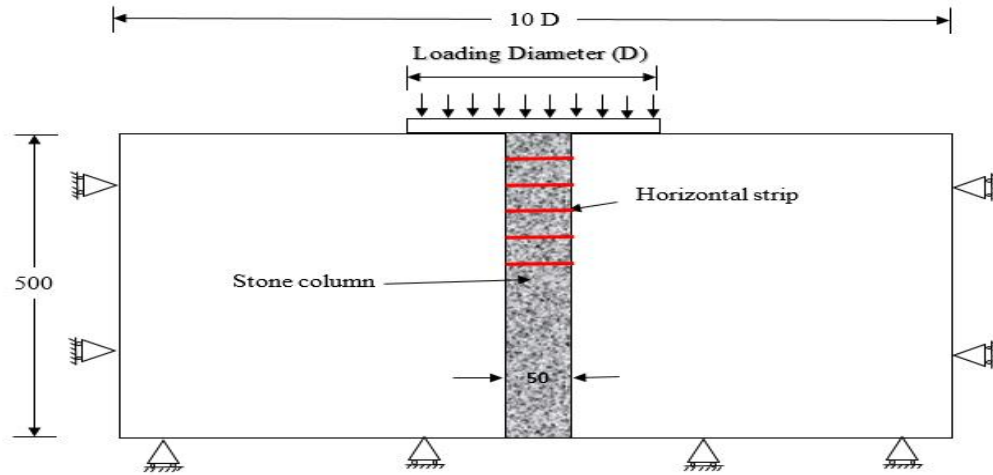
A schematic view of loading plan of stone column with horizontal circular strips
